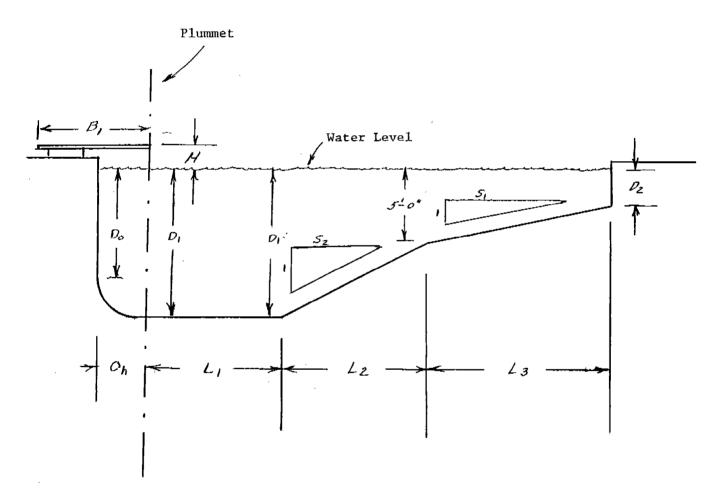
Profile of swimming pool equipped with a diving board and showing locations of critical dimensions specified in table 6-1.
